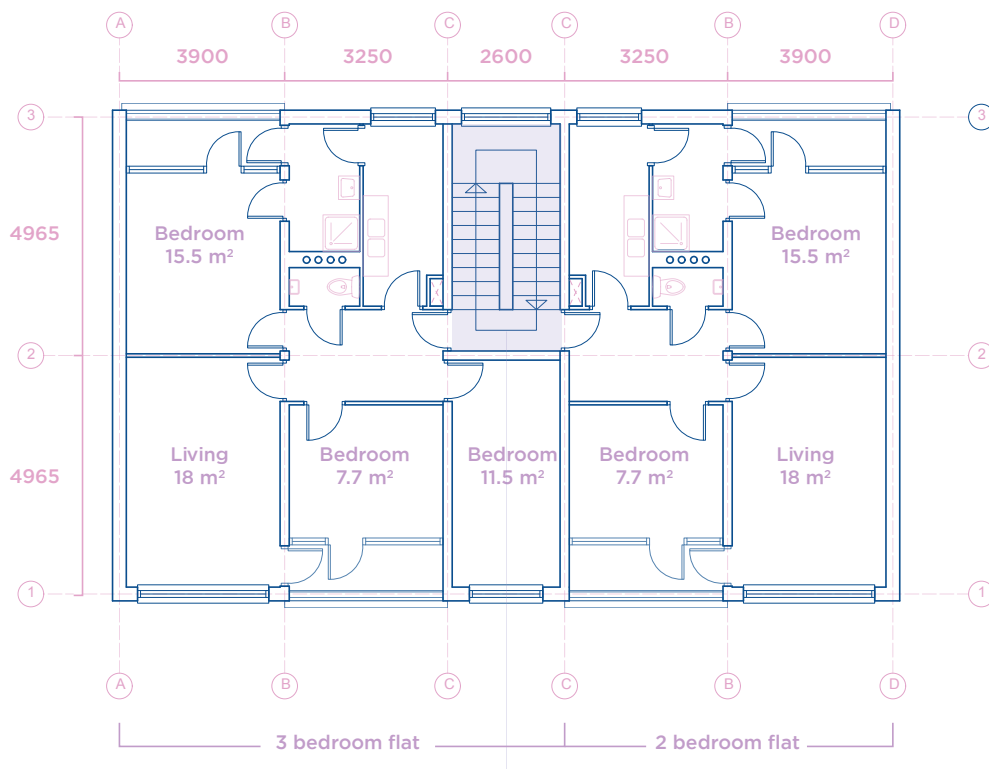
Schematic floor plan of the existing situation (By Author)
